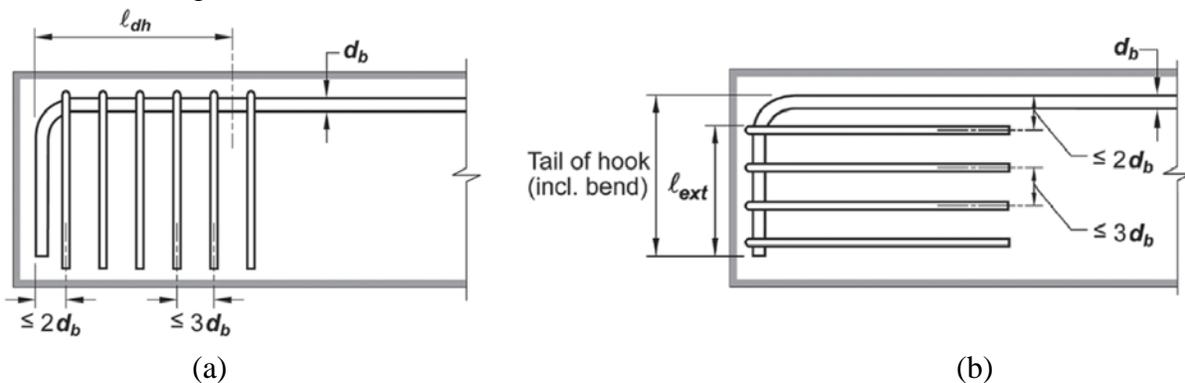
Ties or stirrups placed (a) perpendicular to the bar being developed and (b) parallel to the bar being developed in a cantilever beam (as shown for 90° hooks)
